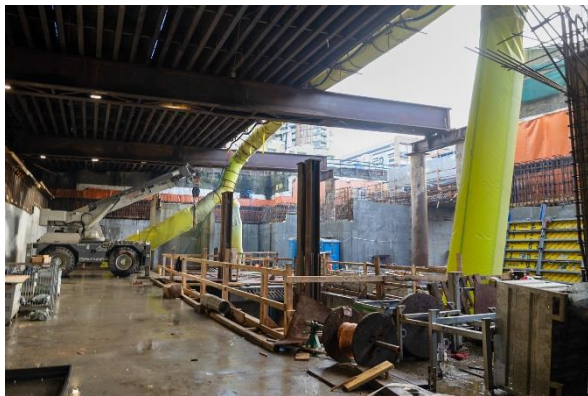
Mount Pleasant Station: Progressing with the construction of the upper-level walls and columns in the station box.
